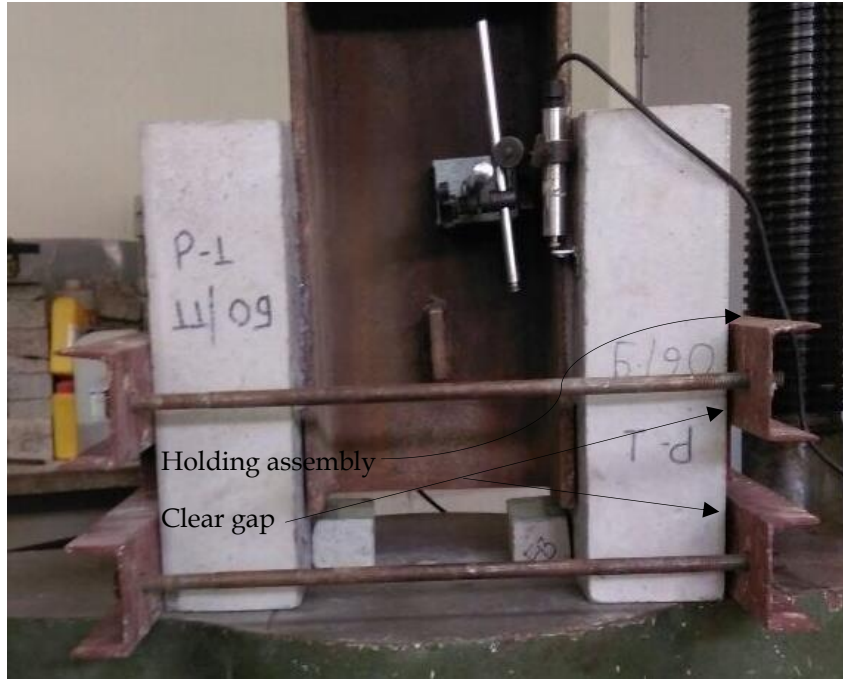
Holding assembly for composite specimen to prevent accidental damage
